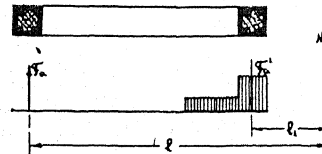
CALCULATED DIAGRAM OF WALLS STRENGTHENED WITH REINFORCED CONCRETE POSTS
